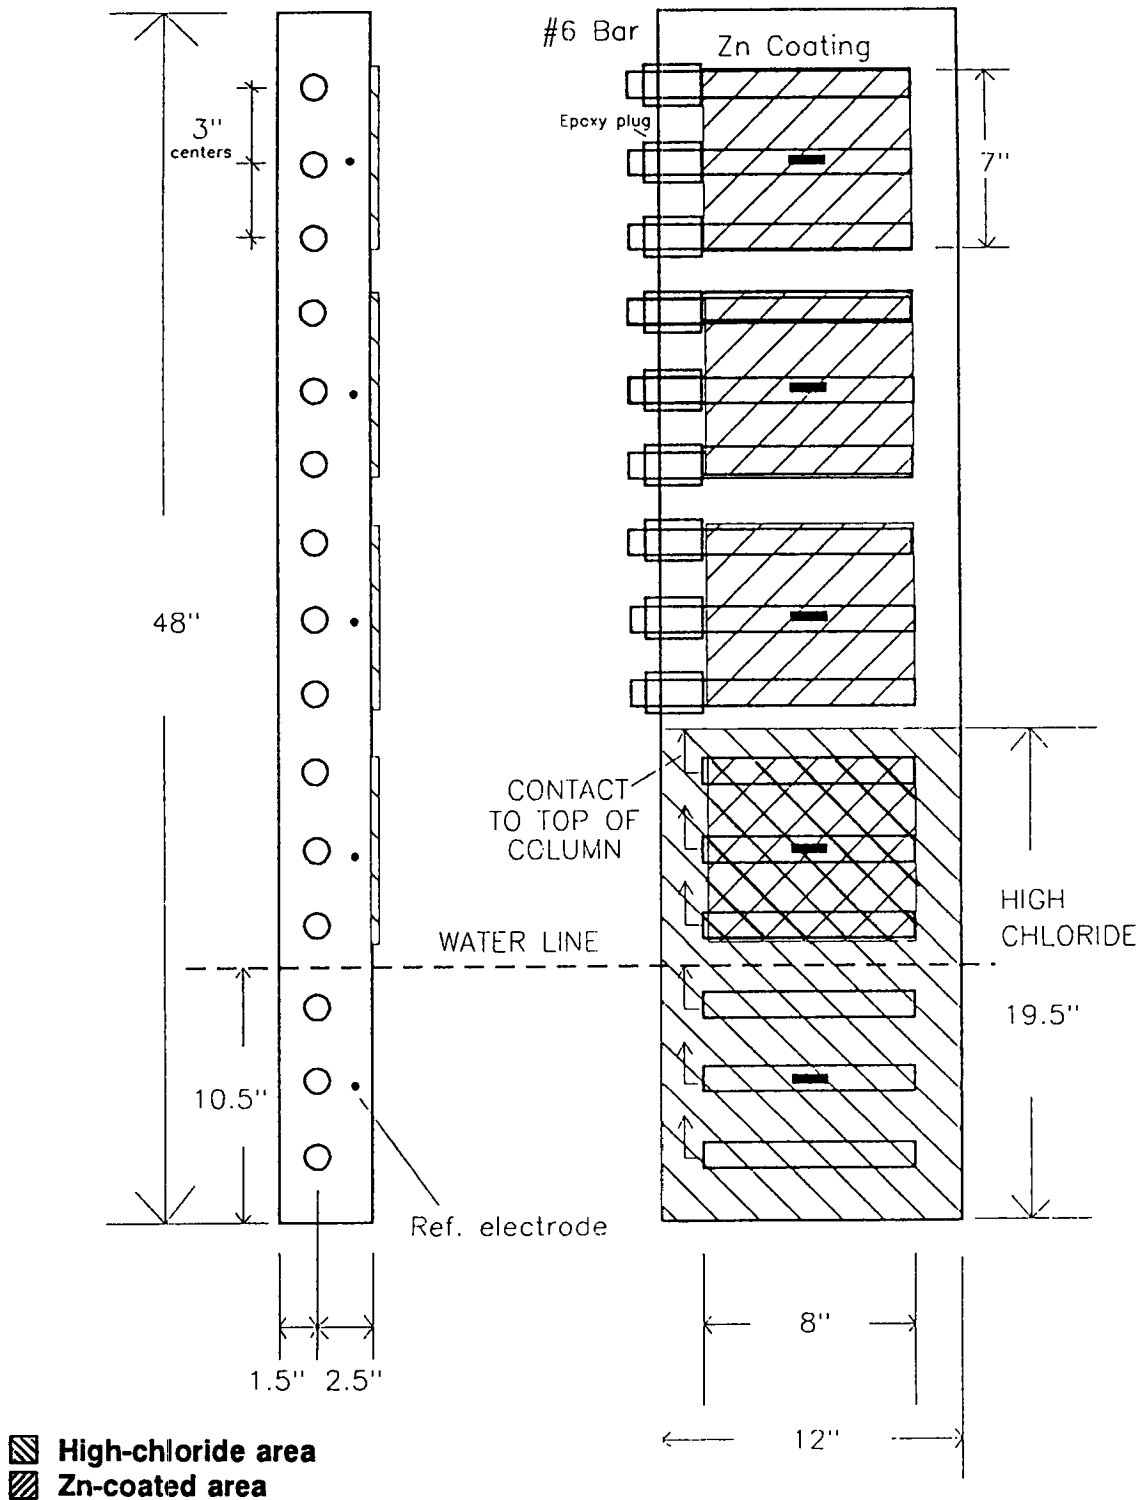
Instrumented test column (1 in. = 2.54 cm)
